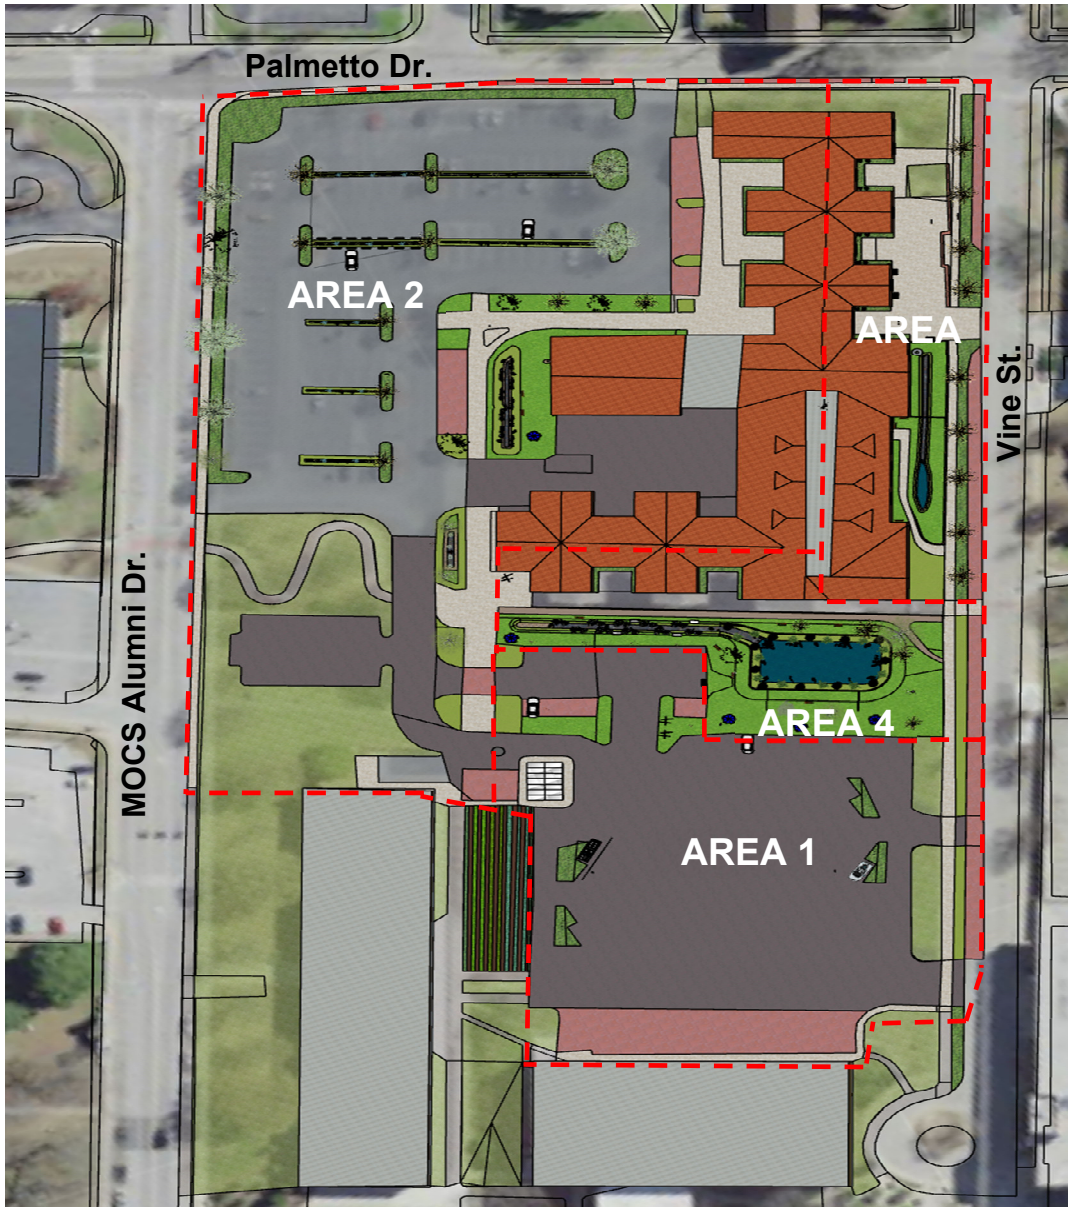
Project Site Overview including Subdrainage Design Areas 1-4.
